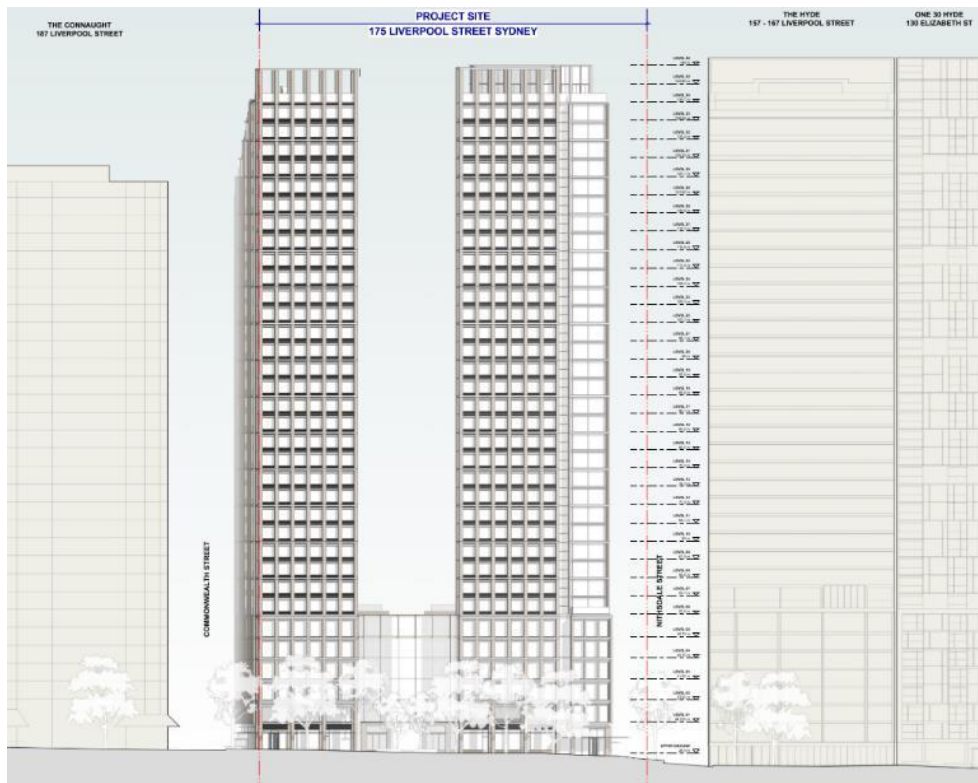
Liverpool Street (north) elevation - Anzac Memorial axis
